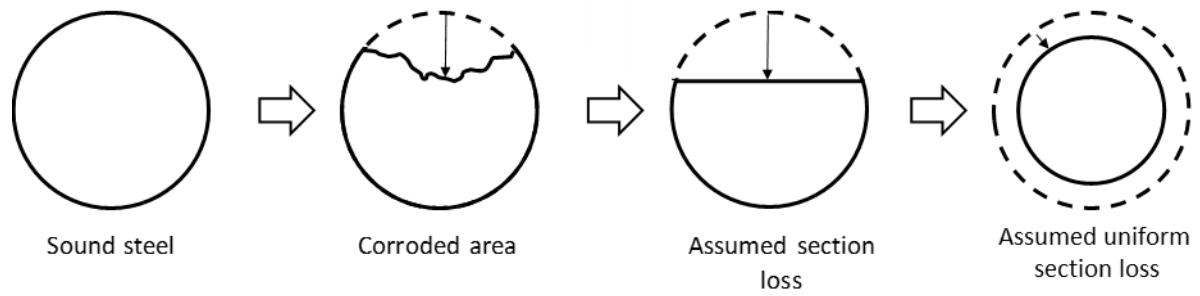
Cross section of rebar. Illustration of calculation of cross section loss based on measured maximum pit depth
